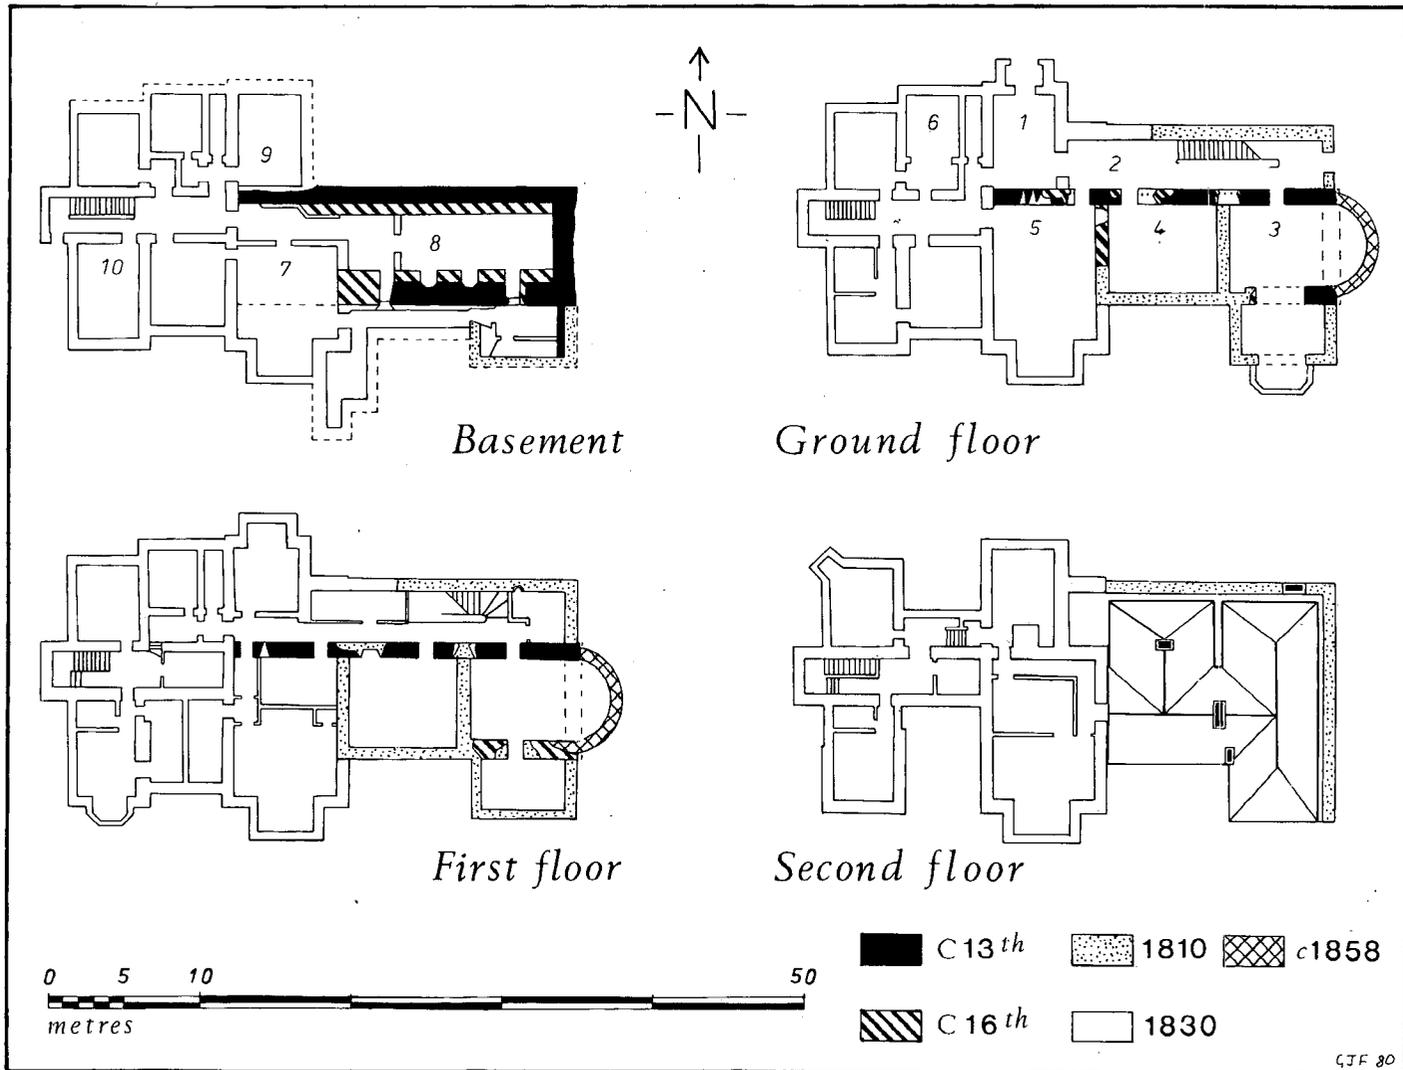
Brinkburn Priory: Existing floor plans, Scale 1 : 500. Key: 1 Entrance; 2 Gallery; 3 Drawing Room; 4 Library; 5 Dining Room; 6 Small Dining Room; 7 Kitchen; 8 Store; 9 Boiler Room; 10 Laundry.
